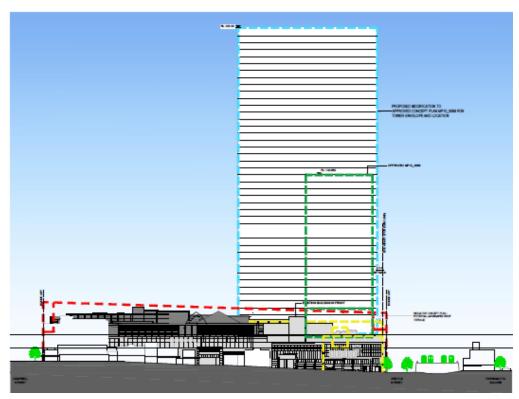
Proposed Church Street elevation with previous approved tower in green dashed line and proposed modification to tower envelope in blue dashed line. (Scentre Group 2018)
